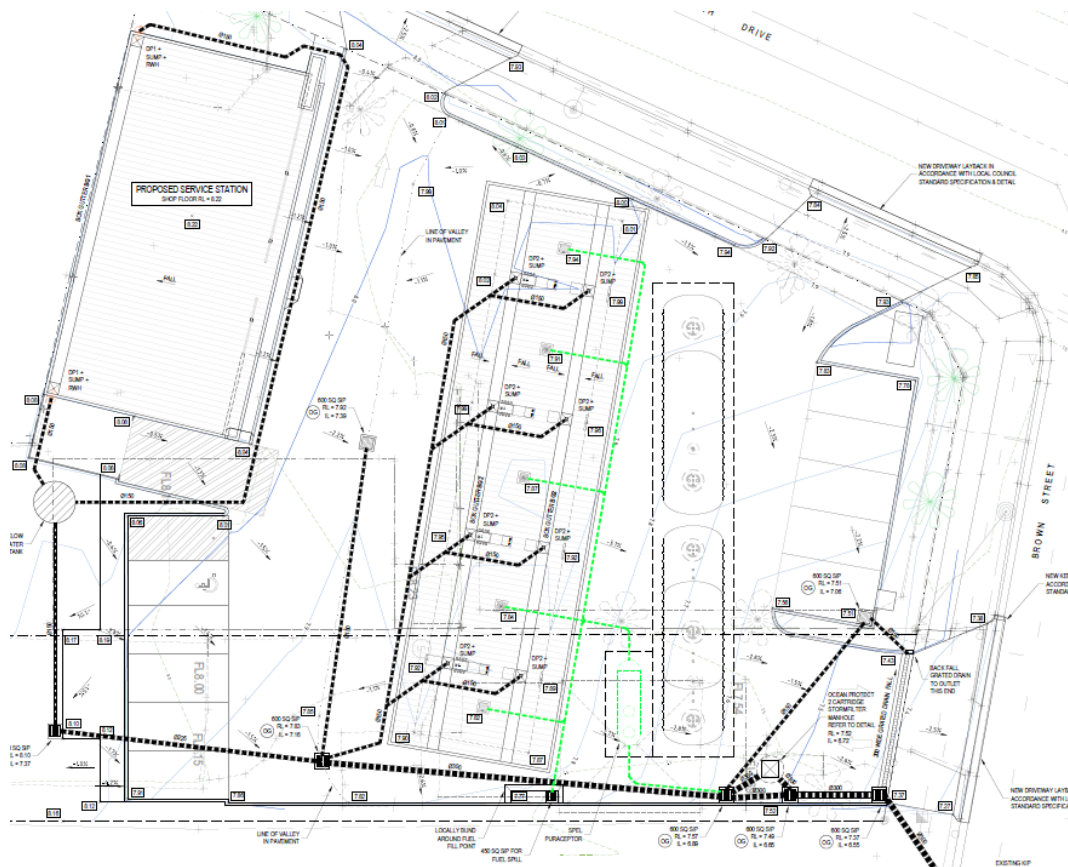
Proposed Development Site Levels with Drainage Plan Overlay
